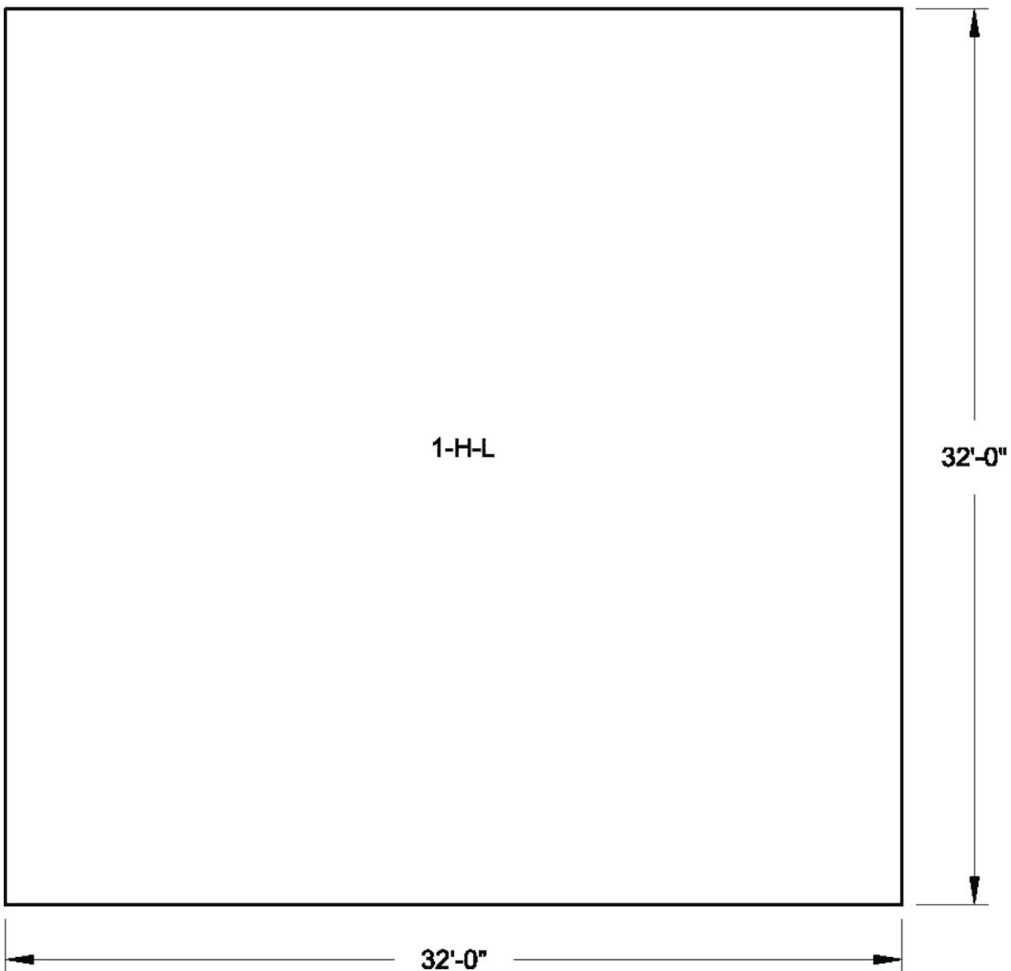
H.6-186 DGFOSV Wall 12 Looking From Outside Vertical Reinforcement Zones Near Side Face
